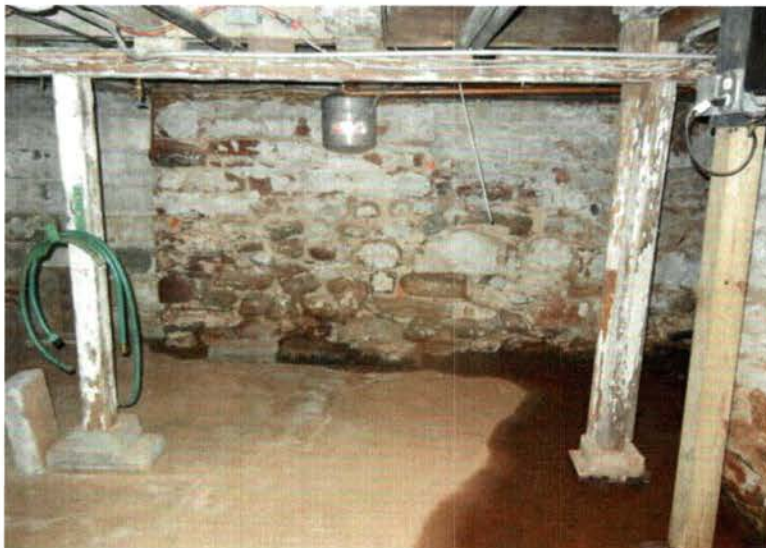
Cellar B (Room 002) looking east. An intermediate beam and posts (all whitewashed) were installed to provide additional support to the 1st floor framing. Due to deterioration caused by persistent water, the posts' bases have been cut and replaced by masonry units.
